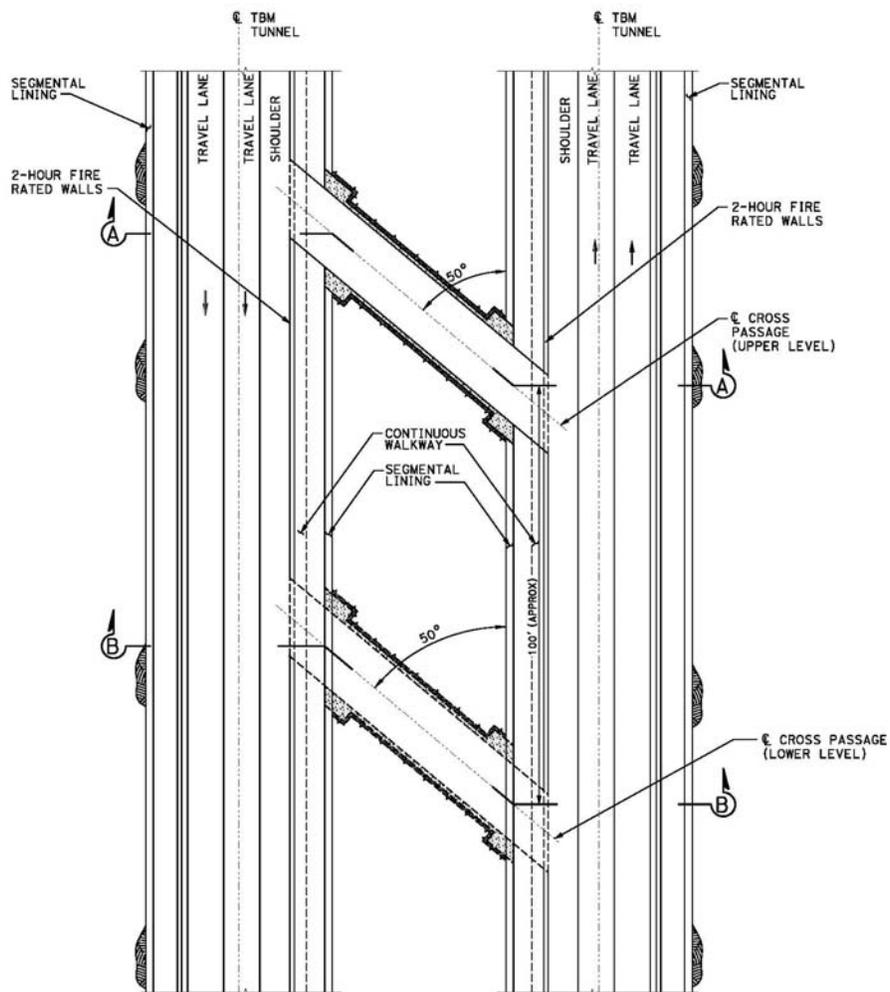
Typical Plan of Cross Passages for Freeway Twin-Bore Tunnel
